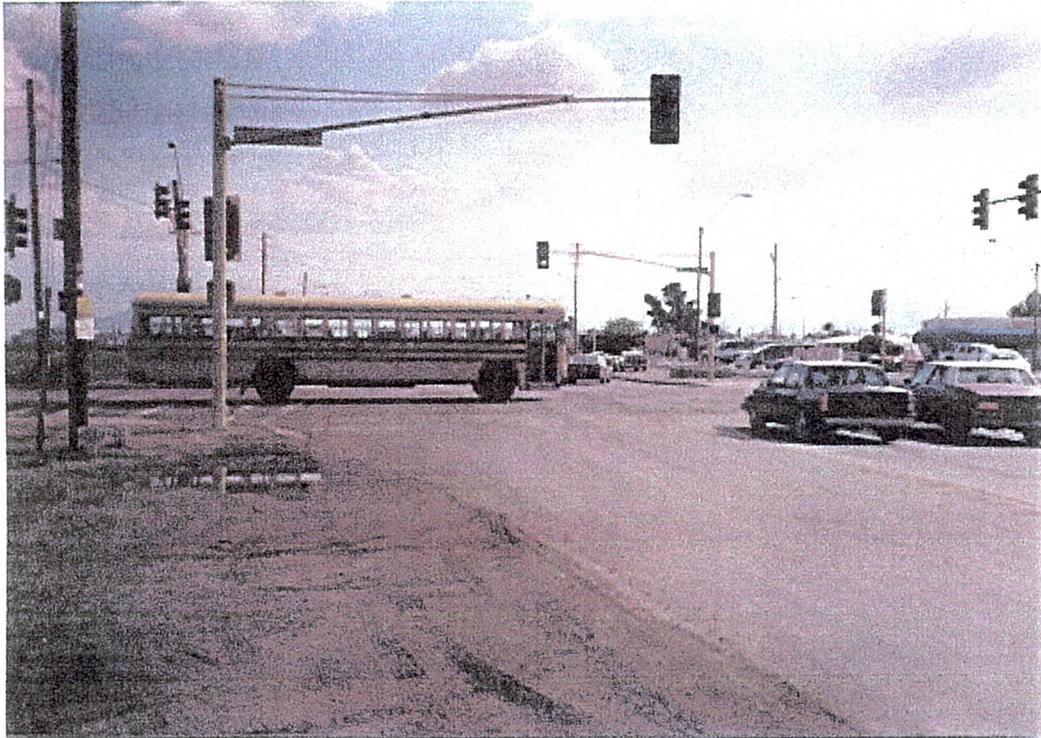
The dry well at a low point of the intersection of 95th Avenue and Van Buren Street.
